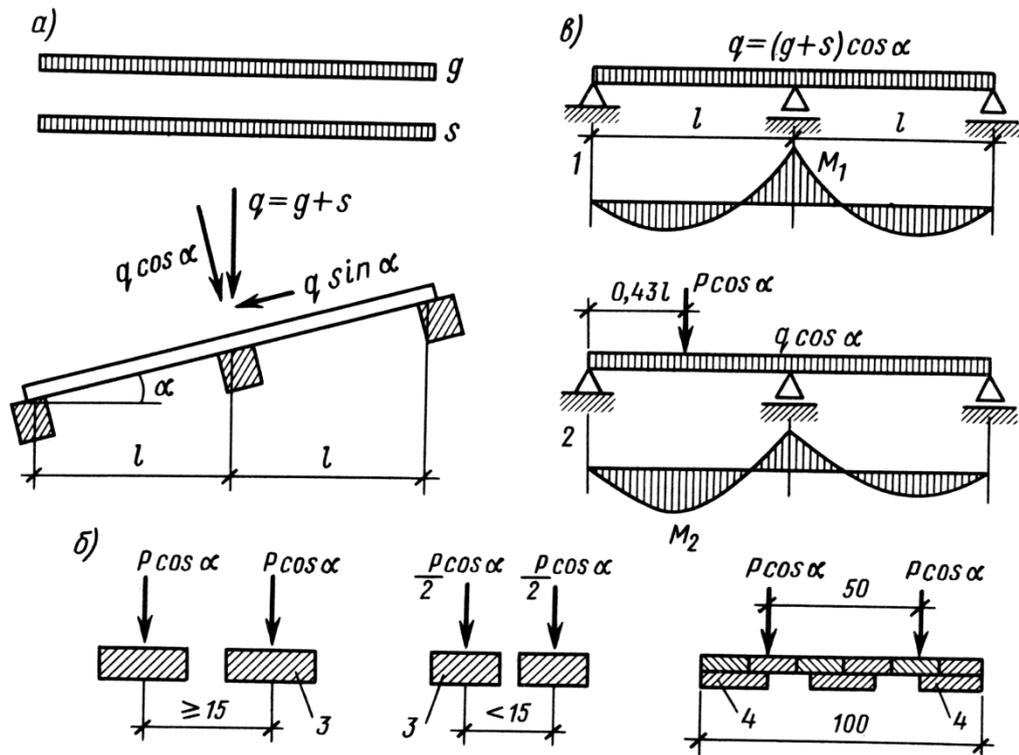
Schemes of calculation of floors: a- scheme of flat loads; b- the same, affecting the point; v- stress scheme; 1- first collective loads; 2- second collective loads; 3- open bed shelves; 4- working floorboards.
